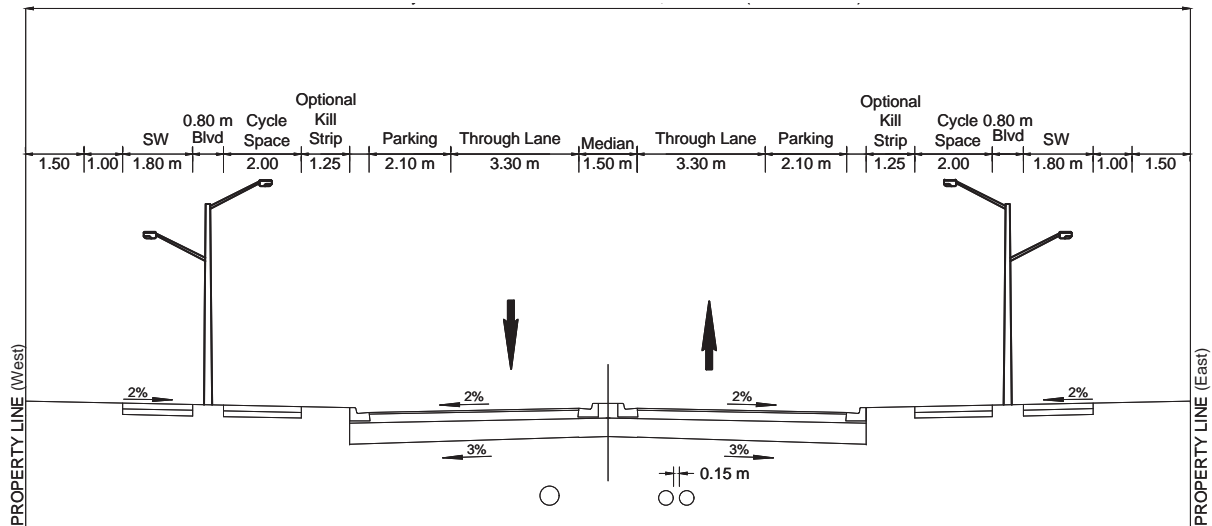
City of Brampton - Clarkway Drive - Collector Road 'C' to East-West Arterial Road - 30.0 Right-Of-Way (Extract from EA study for Arterial Roads within Area 47)
